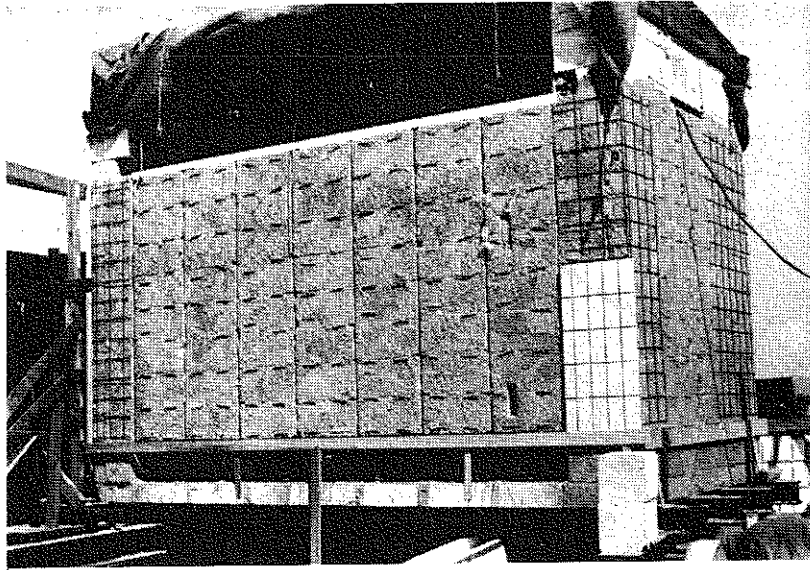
Tile fixing, House I, south wall. Observe the special anchors for the fixing mortar. All wall elements in House I to be observed by strain-gauges etc were provided with these anchors while rest of the wall surfaces were provided with a normal net. The two vertical slots on each wall are holes intended for the moisture observations by use of wedge-shaped test specimens
